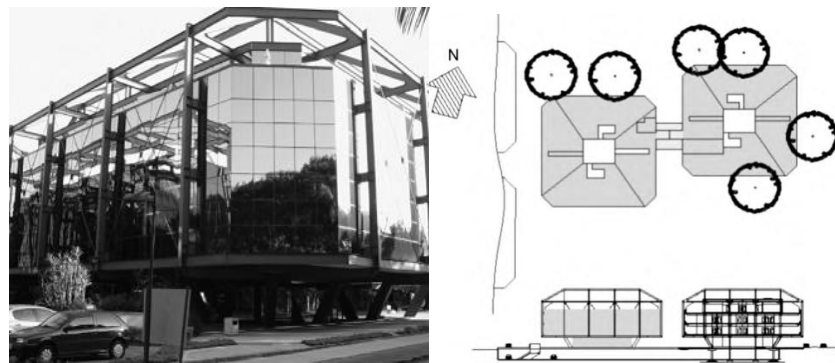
External View of the Facades (right), section and plan of a typical floor with zone layout and existing shading provided by trees and surrounding building (left) (Carvalho, et al, 2010: 3).
